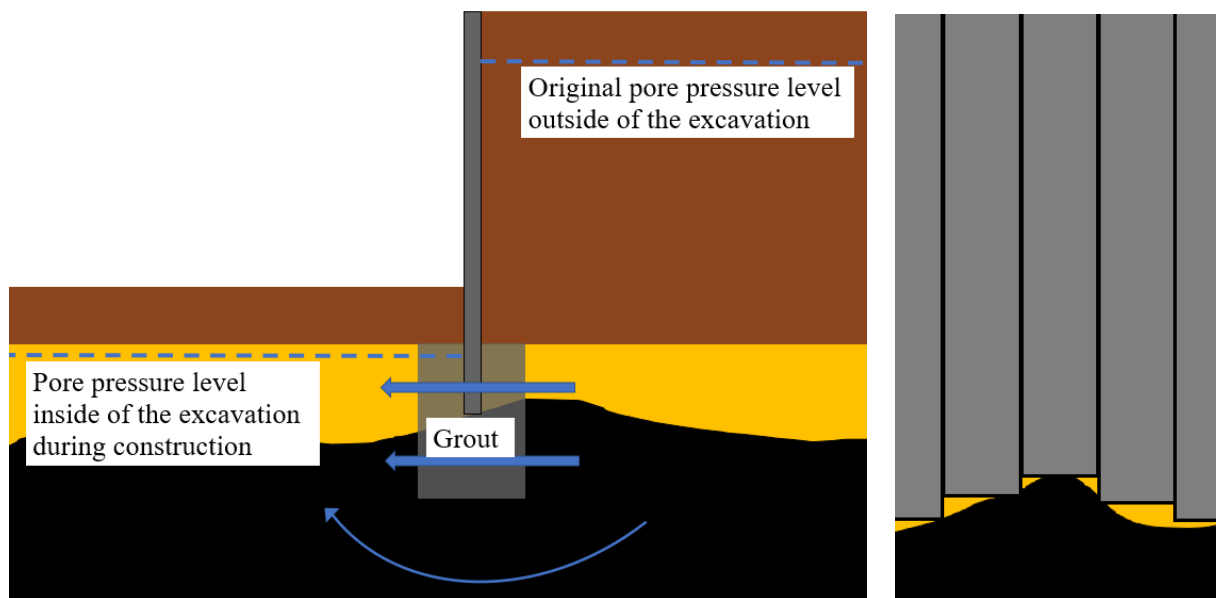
a) Water flow into an excavation, after Persson (2007) b) Gap between retaining wall and bedrock, after Ödlund Eriksson (2014).
